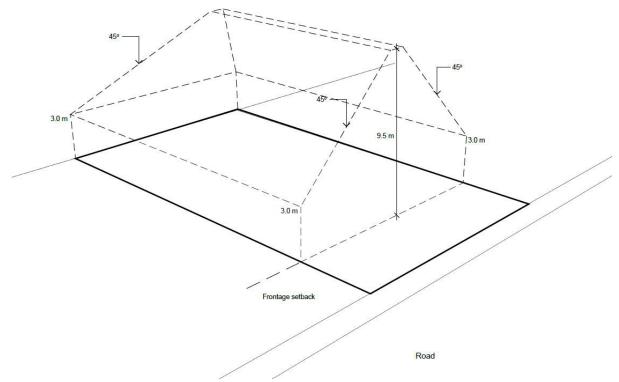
Building envelope as required by clause 11.4.2 A3(a)
